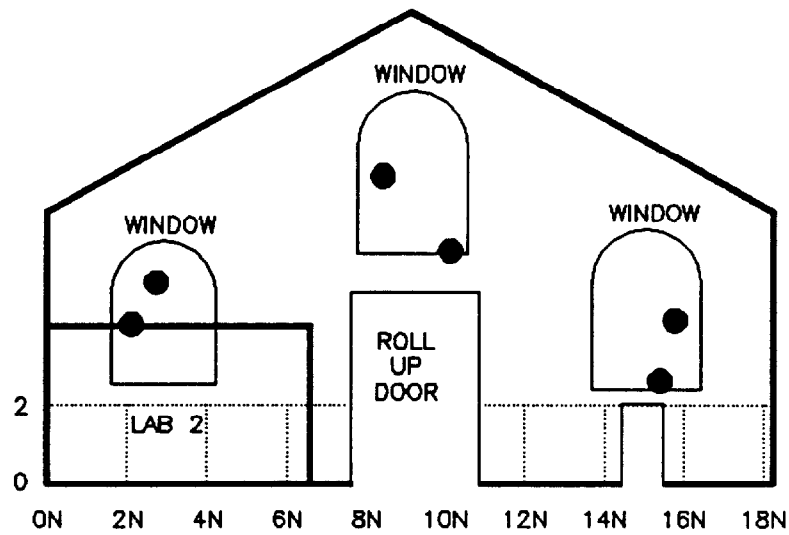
Building 23, Lab 1, Trench #18 and 19 - Measurement Locations
